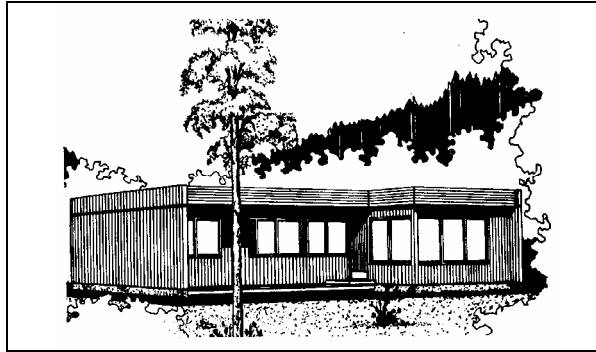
Wooden houses from the 1970s were made entirely flat-roofed.
